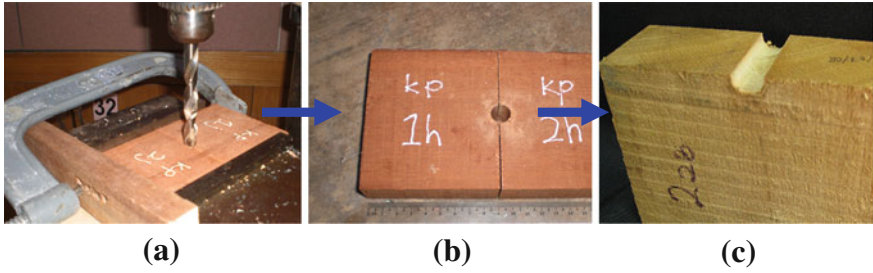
Preparation of half-hole wooden block specimen for bearing test: (a) drilling of specimens, (b) two pieces of specimens and (c) specimen block ready for test
